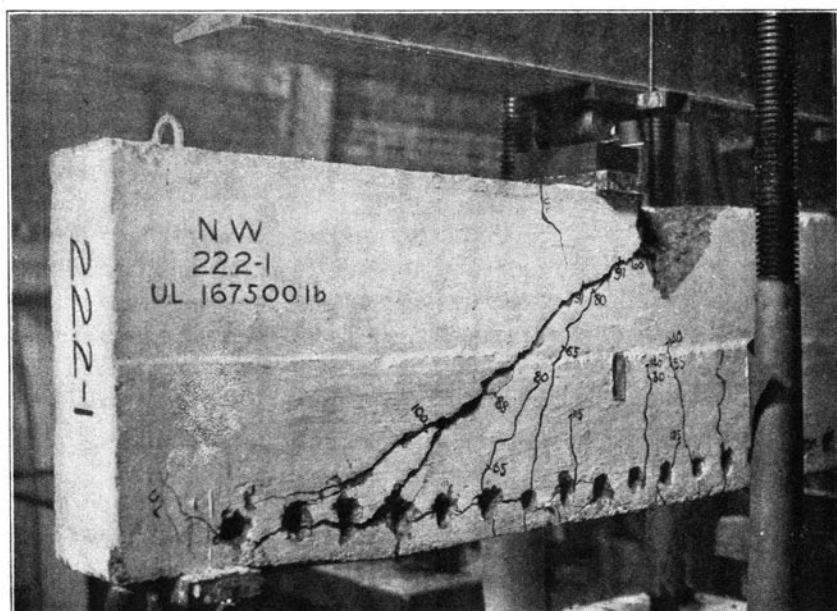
VIEW OF BEAM 222.1 AFTER FAILURE, SERIES OF 1922
